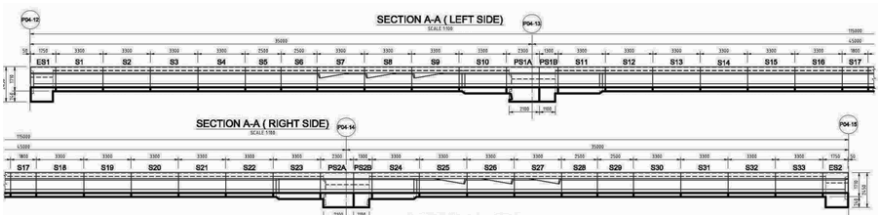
Typical 3-span U-concept continuous bridge (35+45+35) elevation
